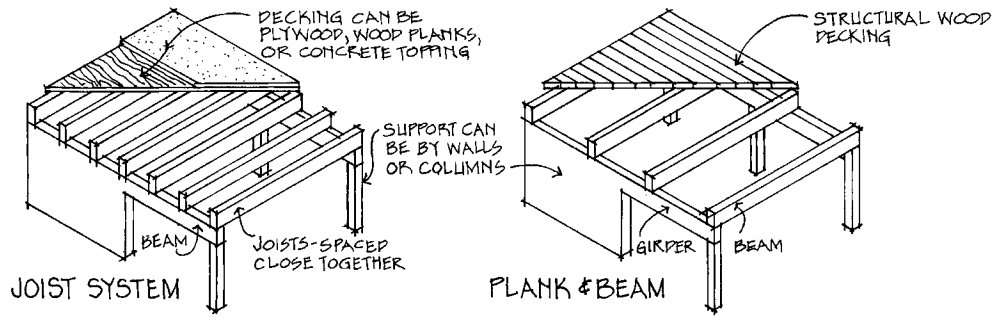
Most buildings have a structural system of a foundation, floor, walls (or columns), and ceiling/roof assemblies.
